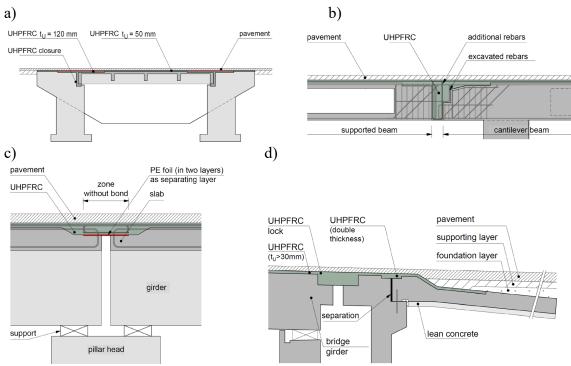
Principle of UHPFRC joint closure: a) in the abutment zones of a single span bridge to create a half-frame, b) force-locked Gerber joint, c) partial joint closure for beam chains, also called "link slab", and d) creation of a semi-integral bridge end.
